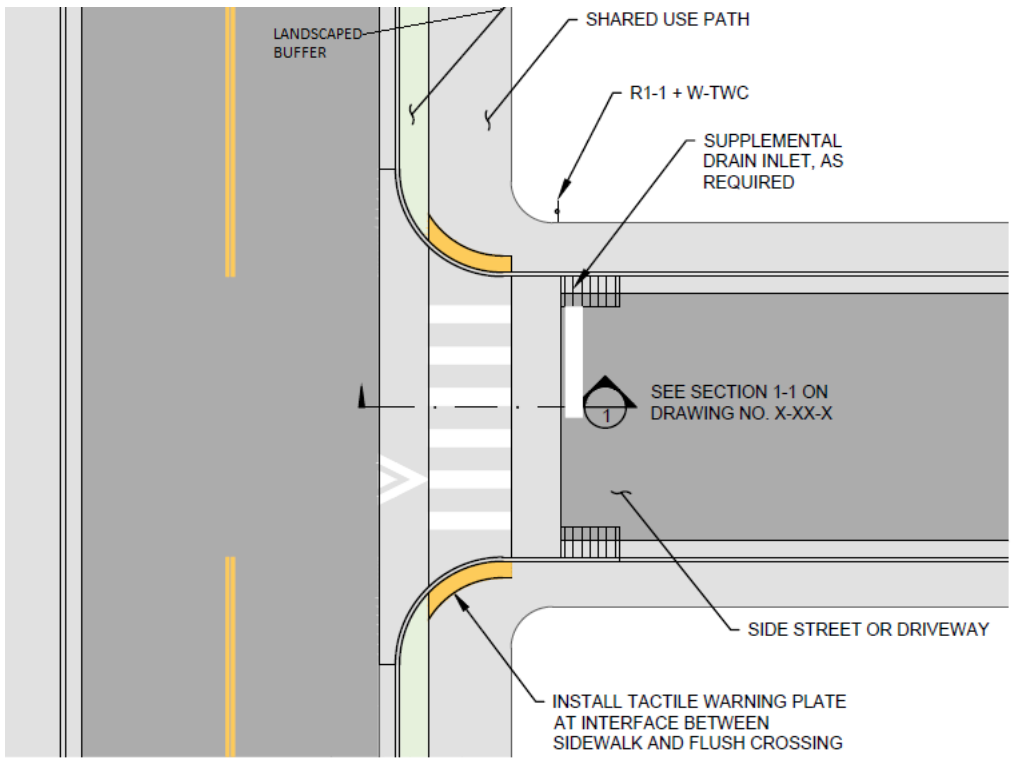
Typical Layout of Raised Crossing at Intersection Leg Location
